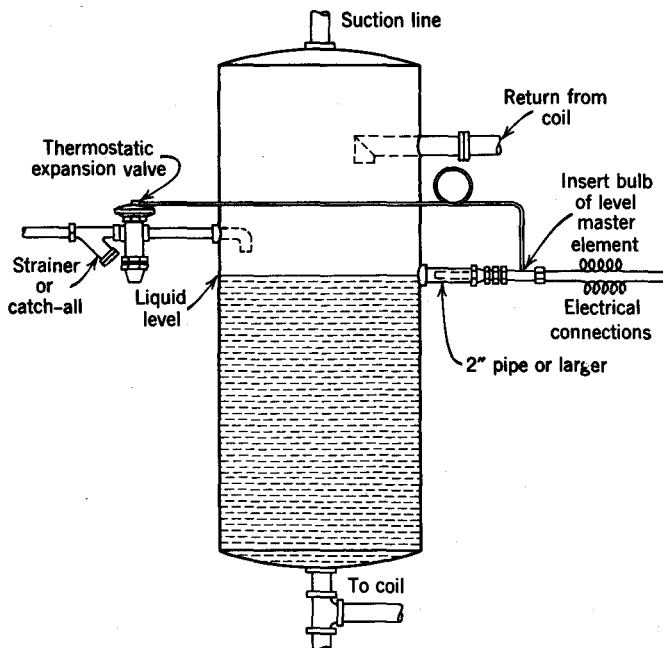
Thermostatic expansion valve used as liquid level control. (Courtesy Sporlan Valve Company.)
